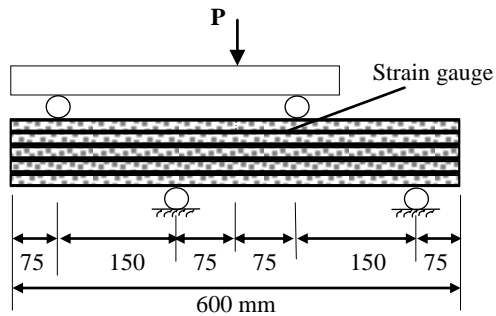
Schematic illustration for shear test of sandwich beams (units in mm)
